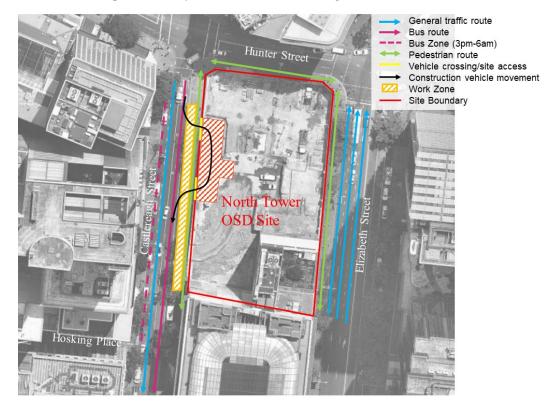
TSP 1 Site Access and Traffic Staging Plan
